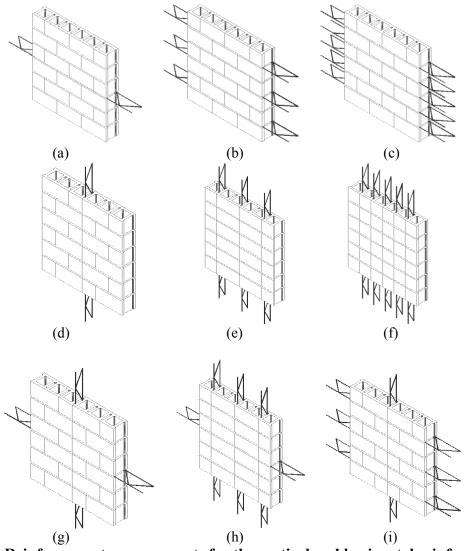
Reinforcement arrangements for the vertical and horizontal reinforcements; (a) specimen HRM1; (b) specimen HRM2; (c) specimen HRM3; (d) specimen VRM1; (e) specimen VRM2; (f) specimen VRM3; (g) specimen VHRM2 (h) specimen; VHRM2; (i) specimen VHRM3
